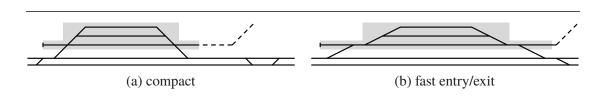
Generic track layout for arrival and departure sidings. Fast entry or exit (b) requires flatter switch angles (source: own)
